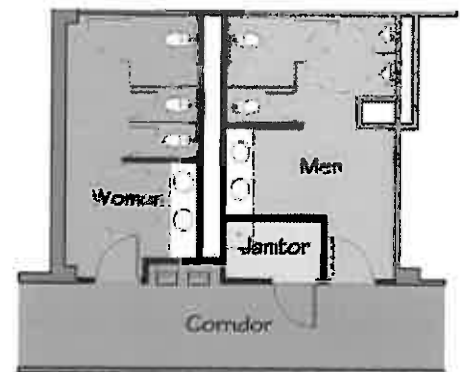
Figure B - Proposed layout of renovated first, second and third floor multi-user toilets
